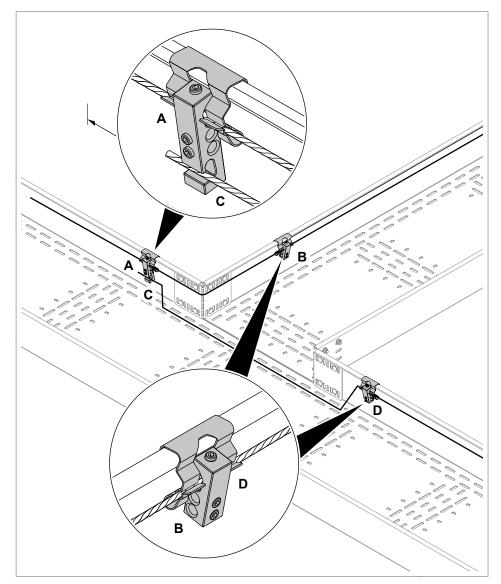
BKRS, mounting of conductor cable branch, double connection terminal
